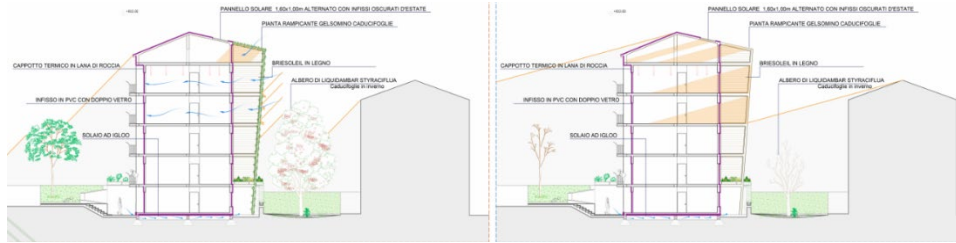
Particular building thermic strategy with solar collection on the façade (summer and winter)
